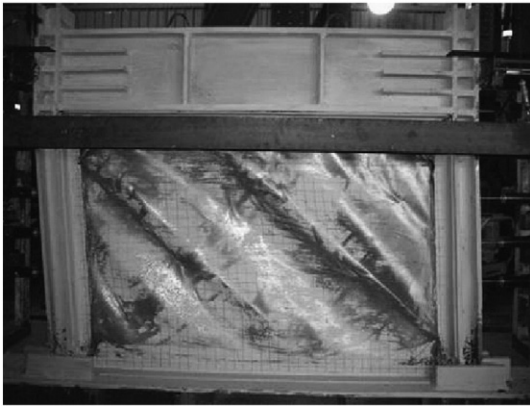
Deformation of DS-PSW specimen at 5.34% drift.
